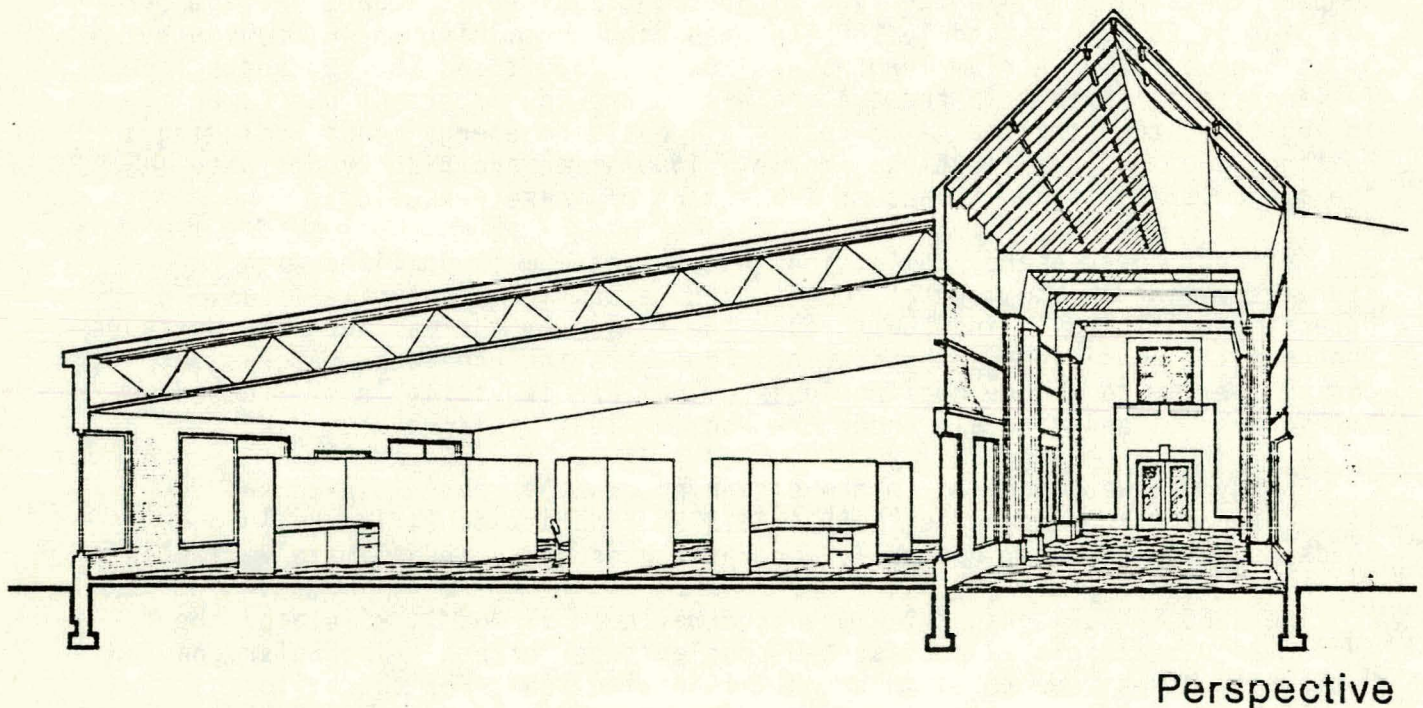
Princeton Professional Park, Princeton, New Jersey (Perspective)
